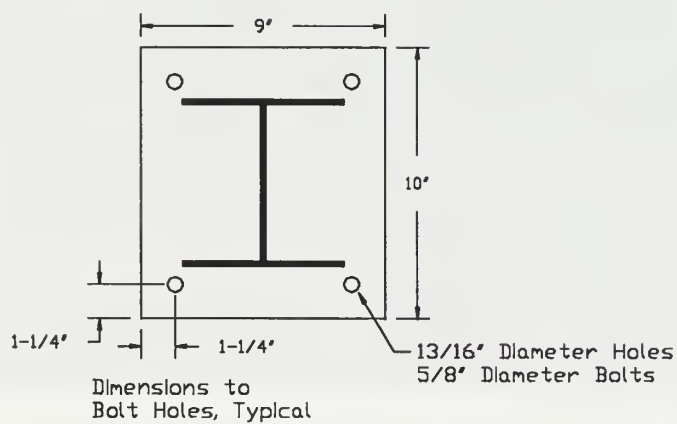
Drawing, Parachute Tower Column Base Plate
